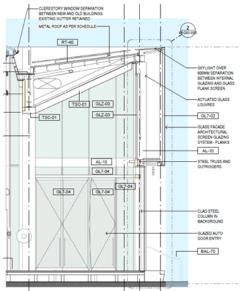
Façade system (Source: Architectural drawing AR-DA2-3000)
